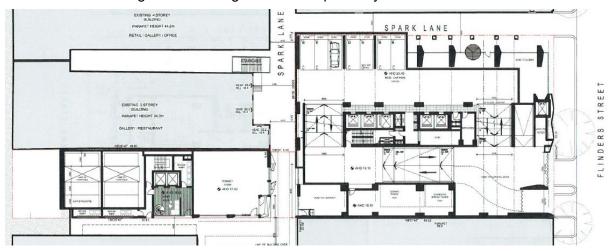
Approved ground floor plan (source: application documents prepared by Urbis)
